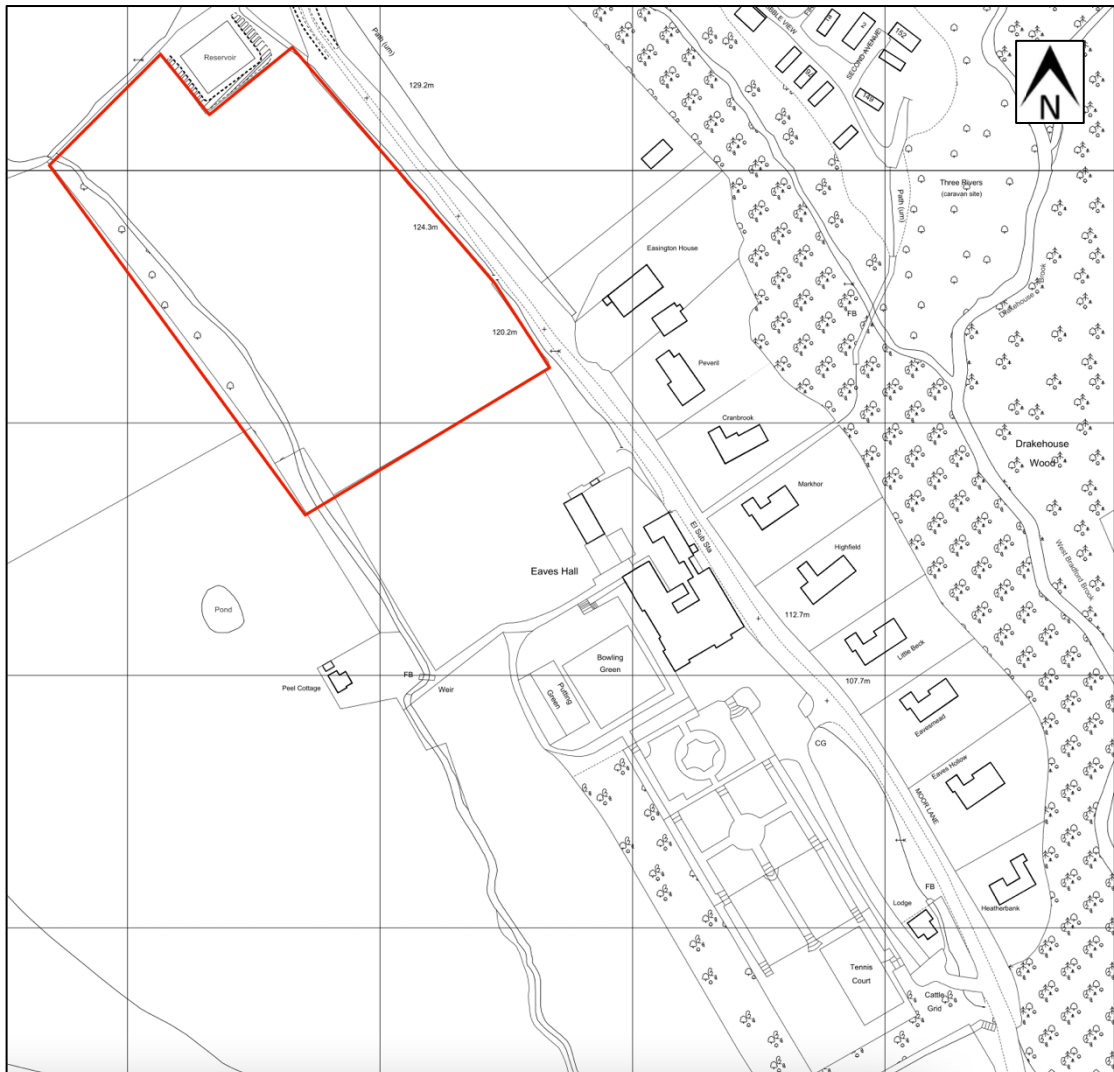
Location plan. Not to scale. Proposal's site indicated in red.
